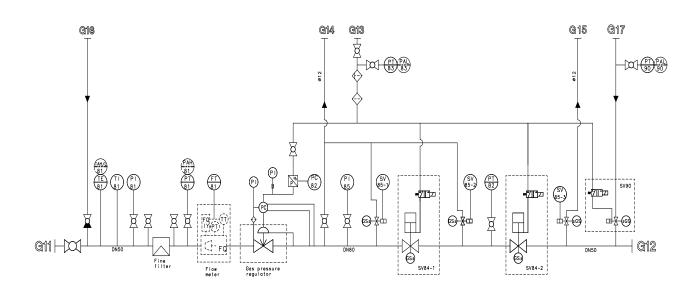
System diagram for enclosed type gas regulating valve unit
